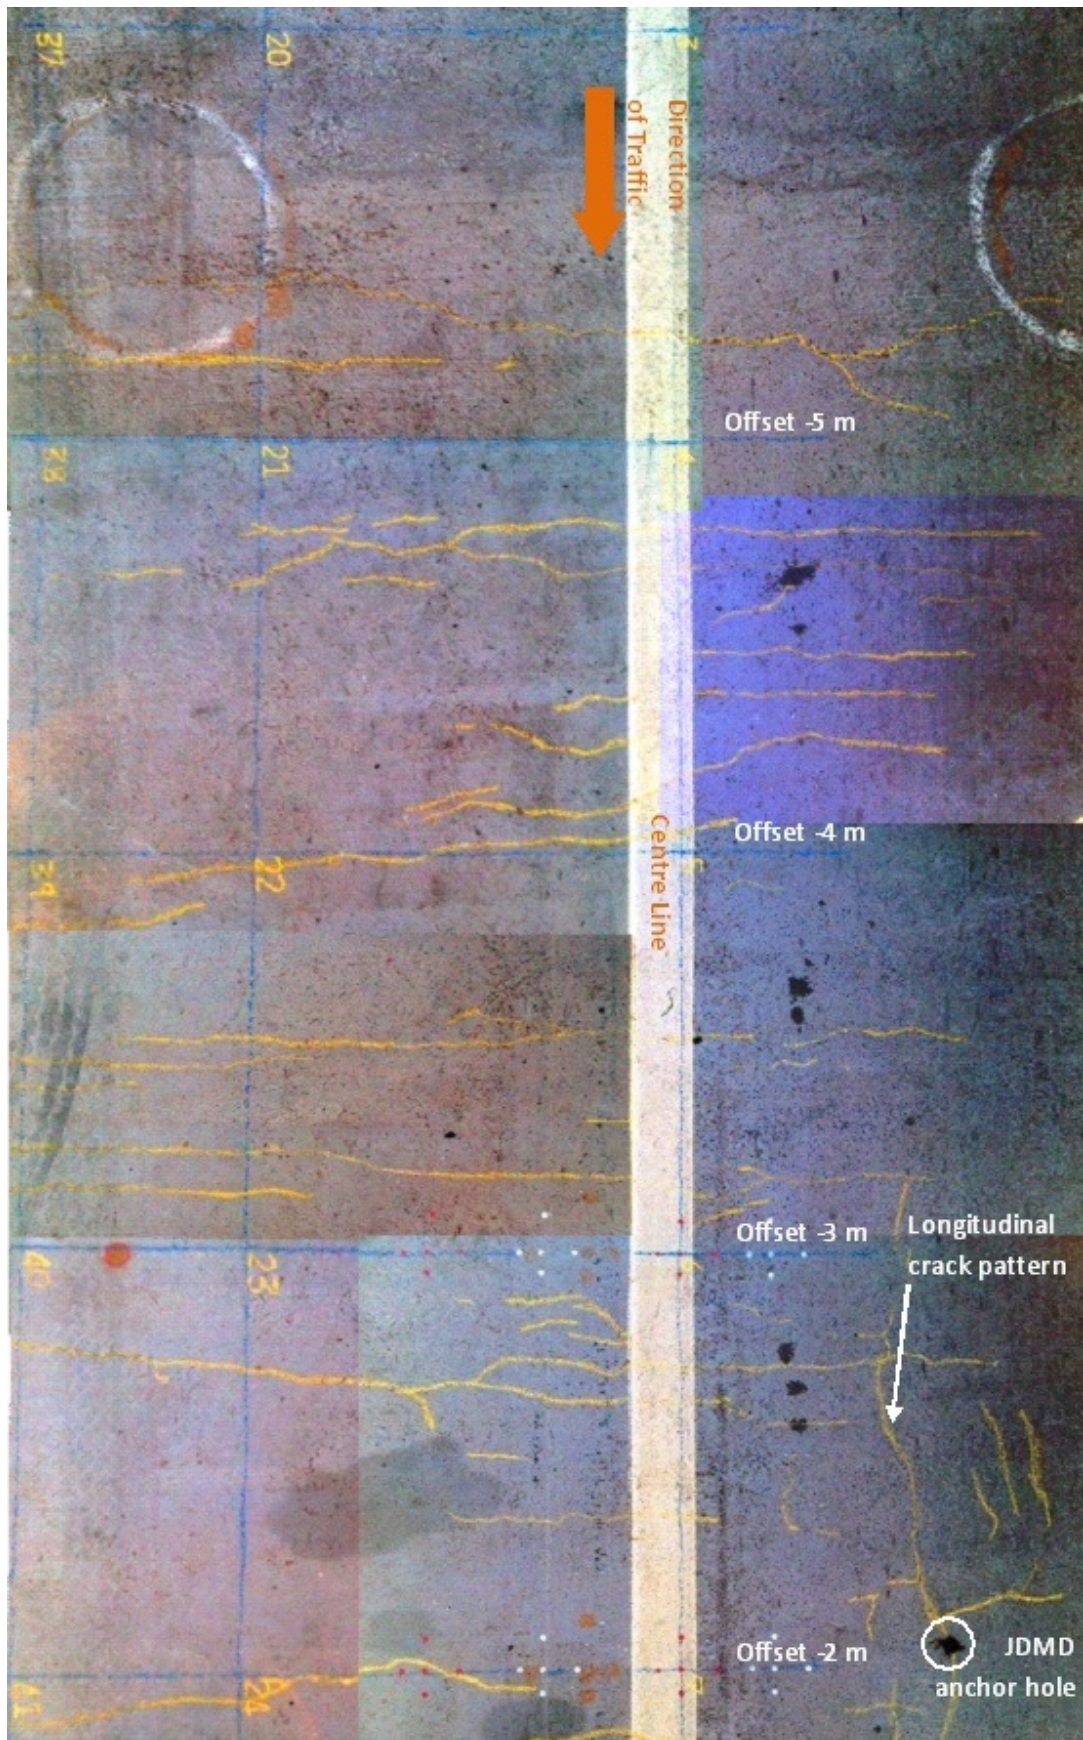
Pictorial view of cracks on test section at longitudinal offsets -5 m to -2 m at 2.8 million load applications
